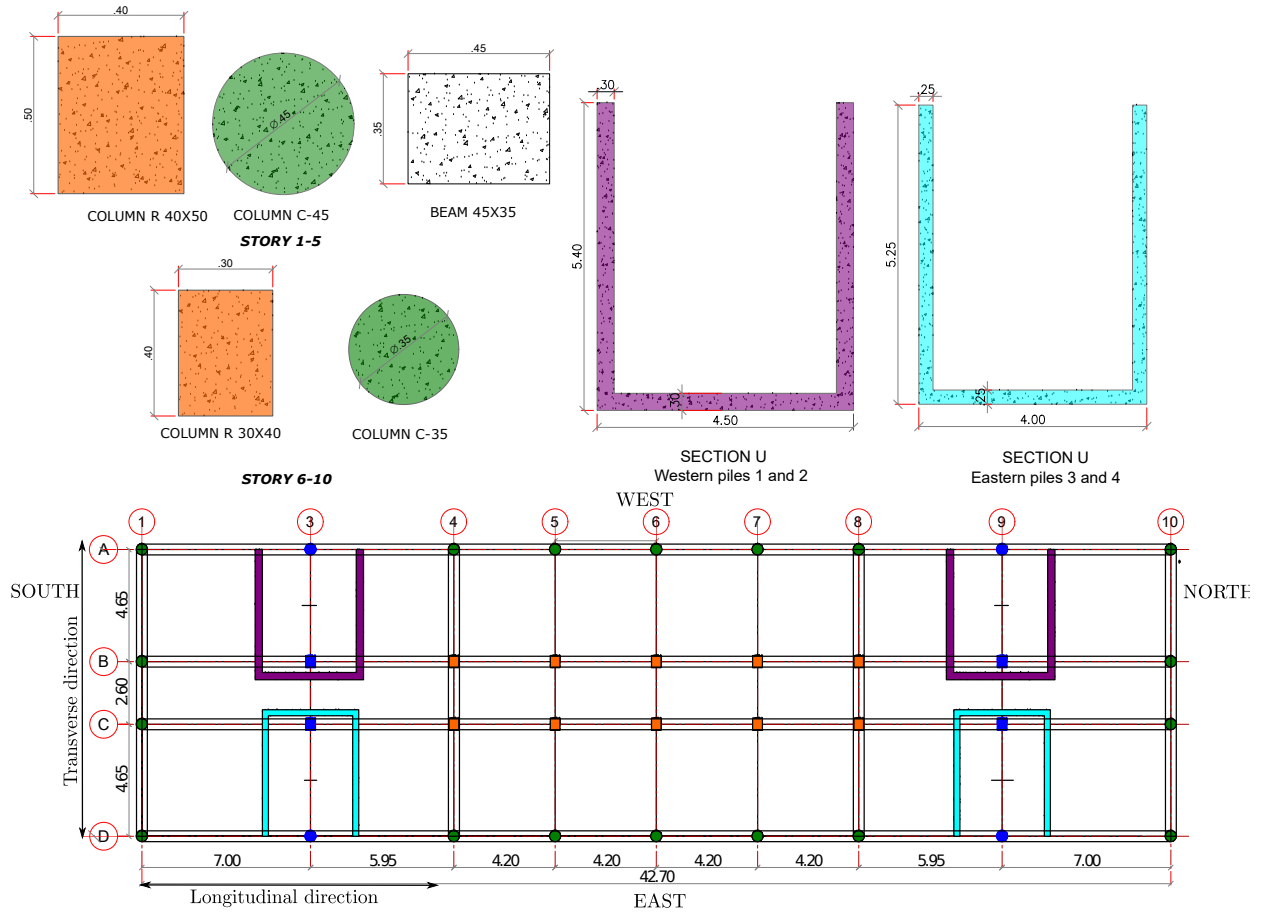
Sections considered in the numerical model (the stories are numbered from the transfer slab). Top left: column and beam sections for the two typical stories. The cross-section of the columns slightly decrease from the 6th story. Top right: pillar sections. Bottom: plan view of the distribution considered in the numerical model
